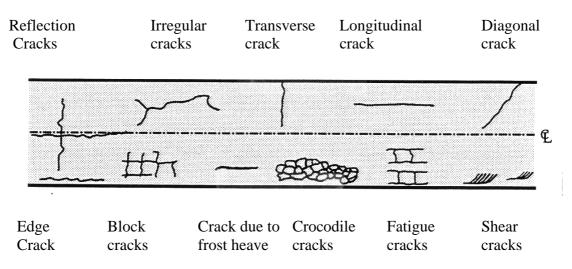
An overview of different types of cracking occurring on asphalt pavements [25].
